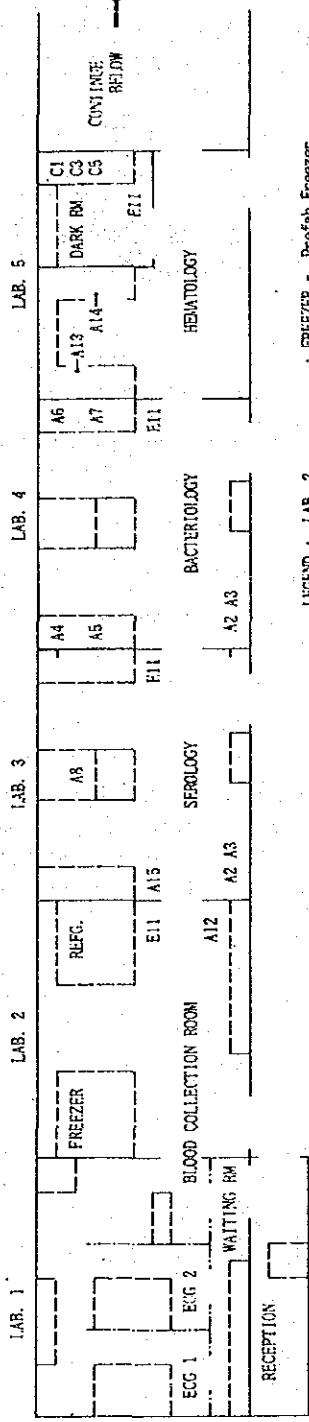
FLOOR LAYOUT OF BE/RHD PROJECT CENTRE LABORATORY
